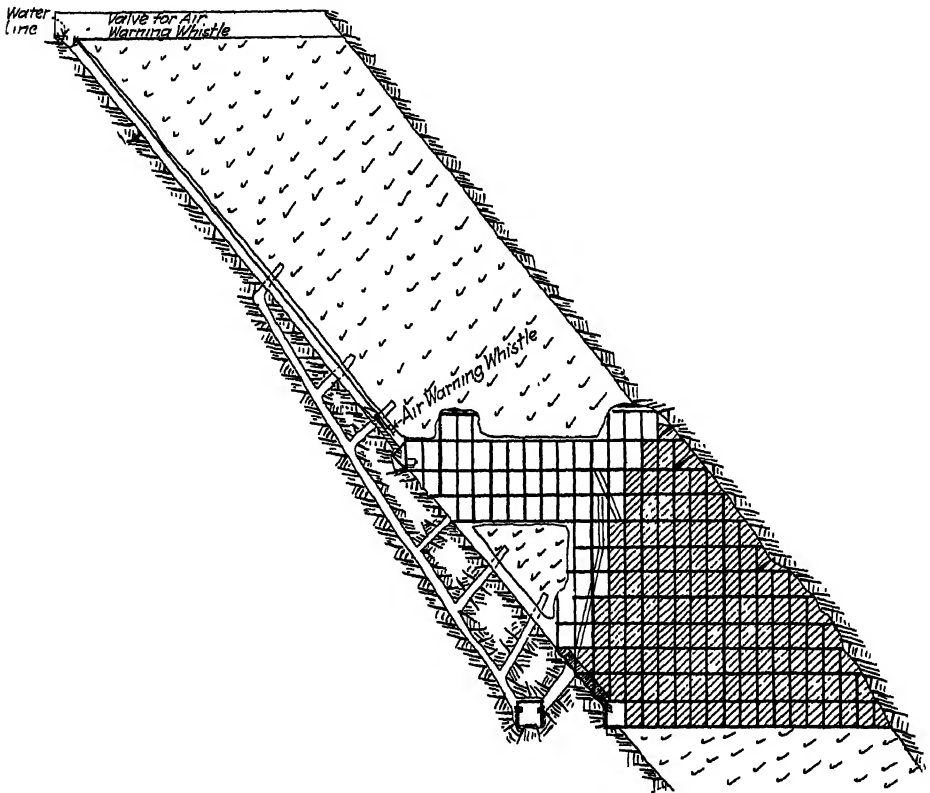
SECTION OF STOPE; SILL FLOOR COMPLETELY FILLED.
